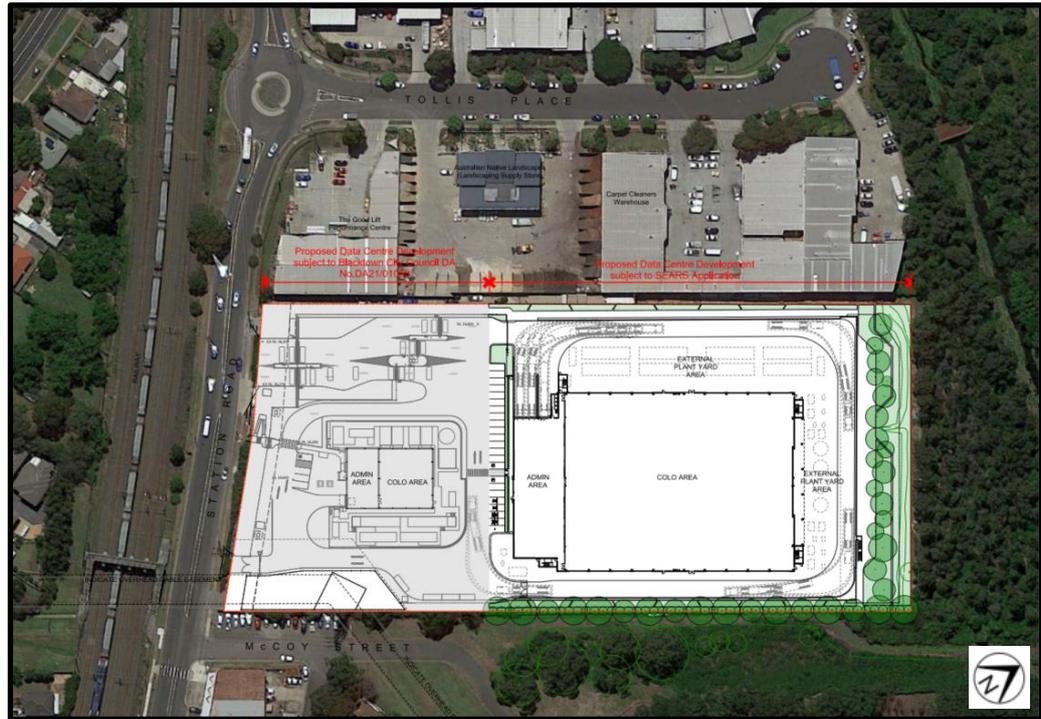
Site Plan for approved data centre on Site, under DA-21-01058 (Source: DEM architects).
